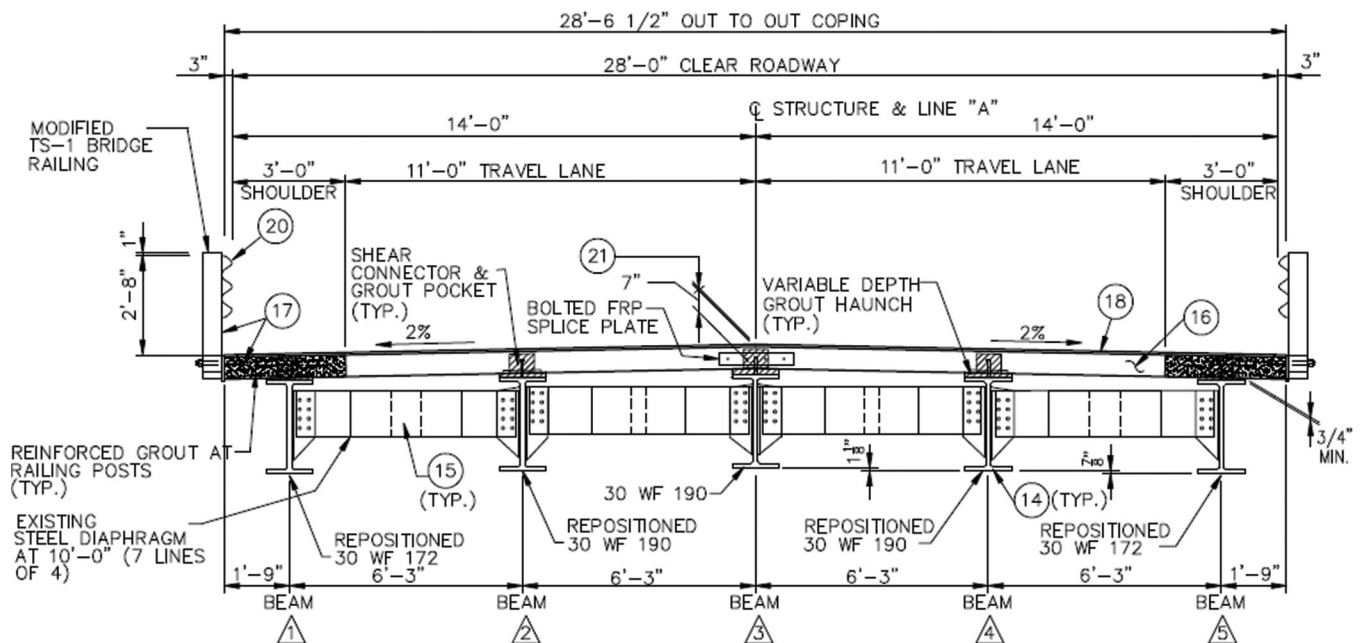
Rehabilitated Sugar Creek Bridge Cross Section
